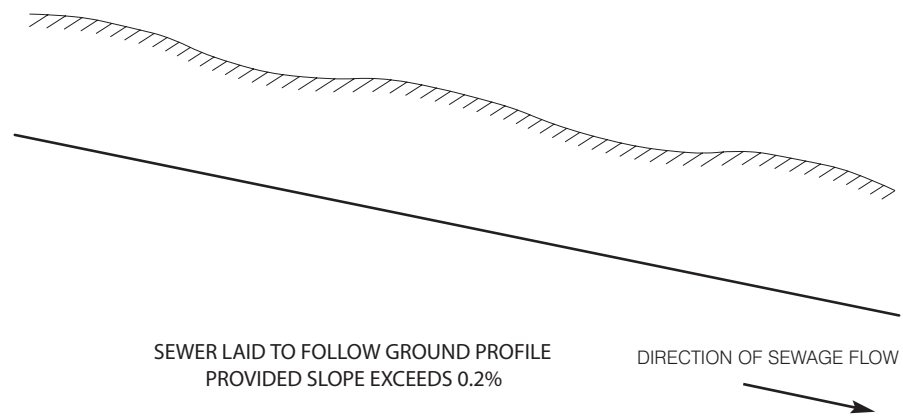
Typical Sewer Profile and Invert Lift Detail
